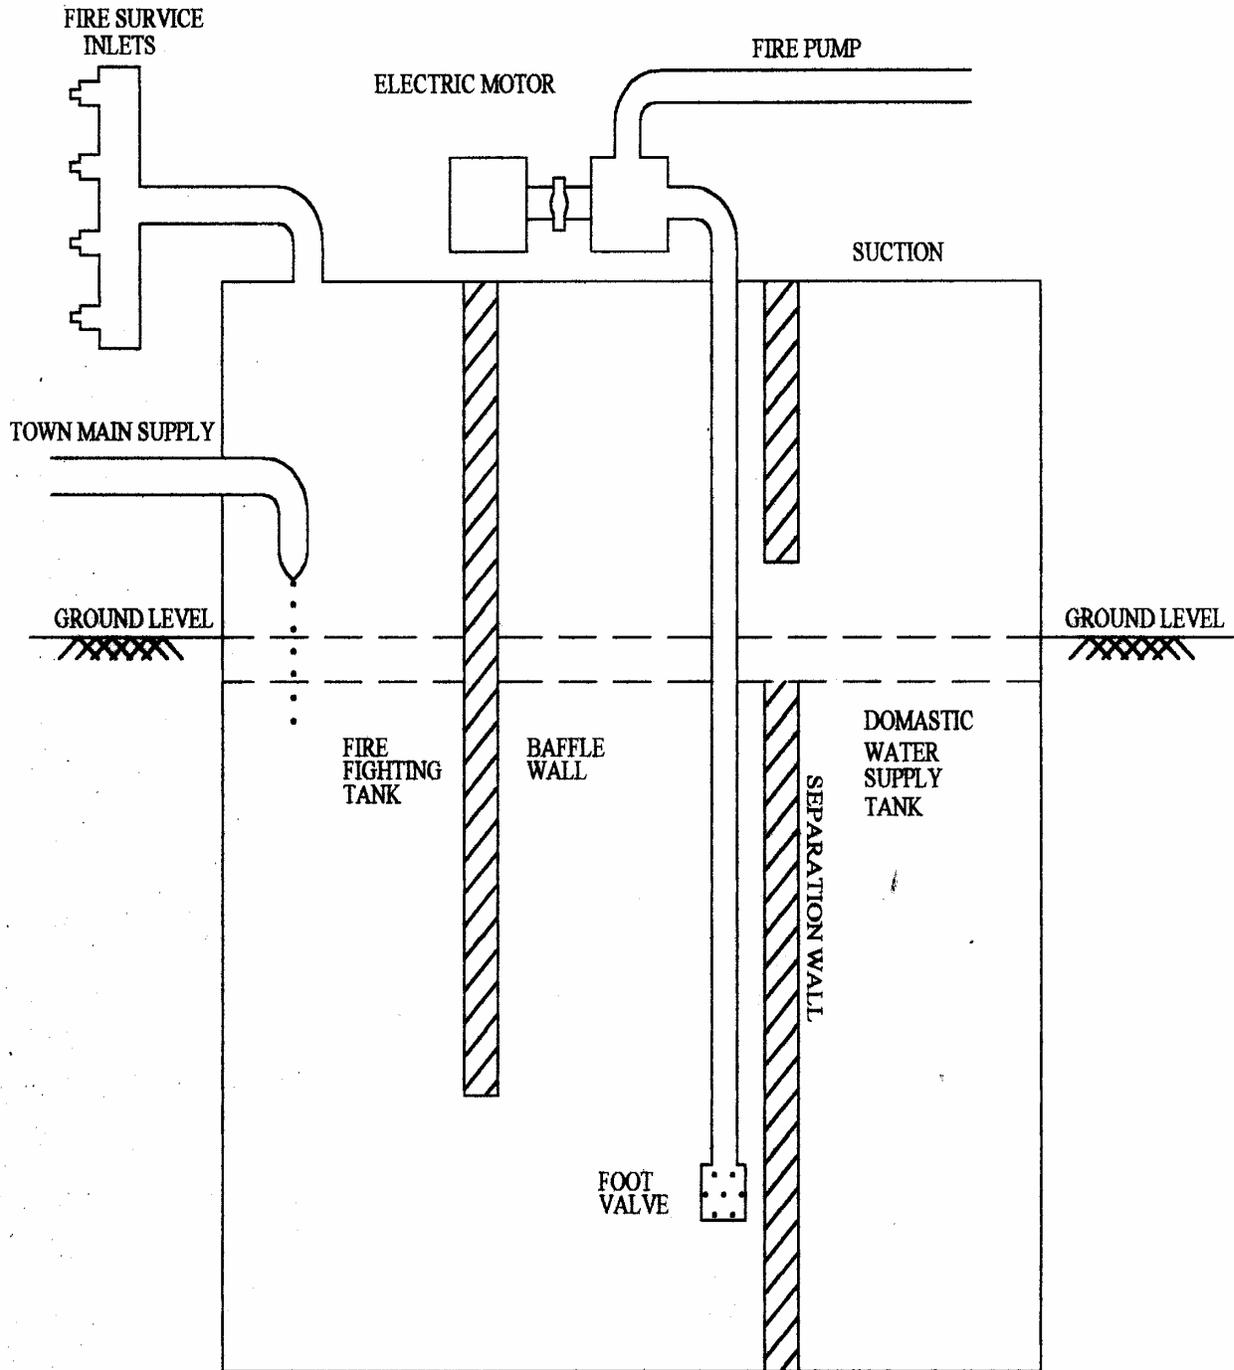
ARRANGEMENT FOR PROVIDING COMBINED FIRE FIGHTING AND DOMESTIC WATER STORAGE TANK AS PER RULE NO:P-12.3.3.
